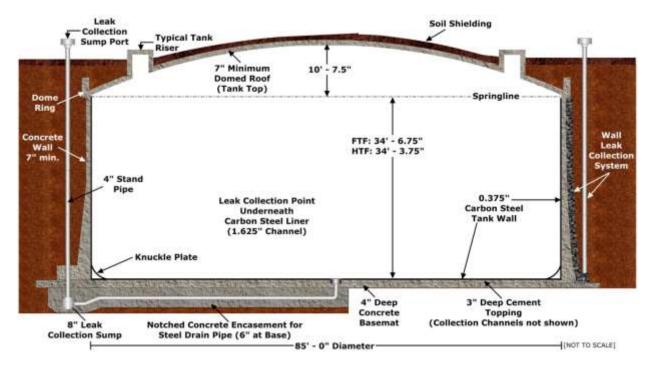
Typical Construction of Type IV Tanks (i.e., Tank 22)
